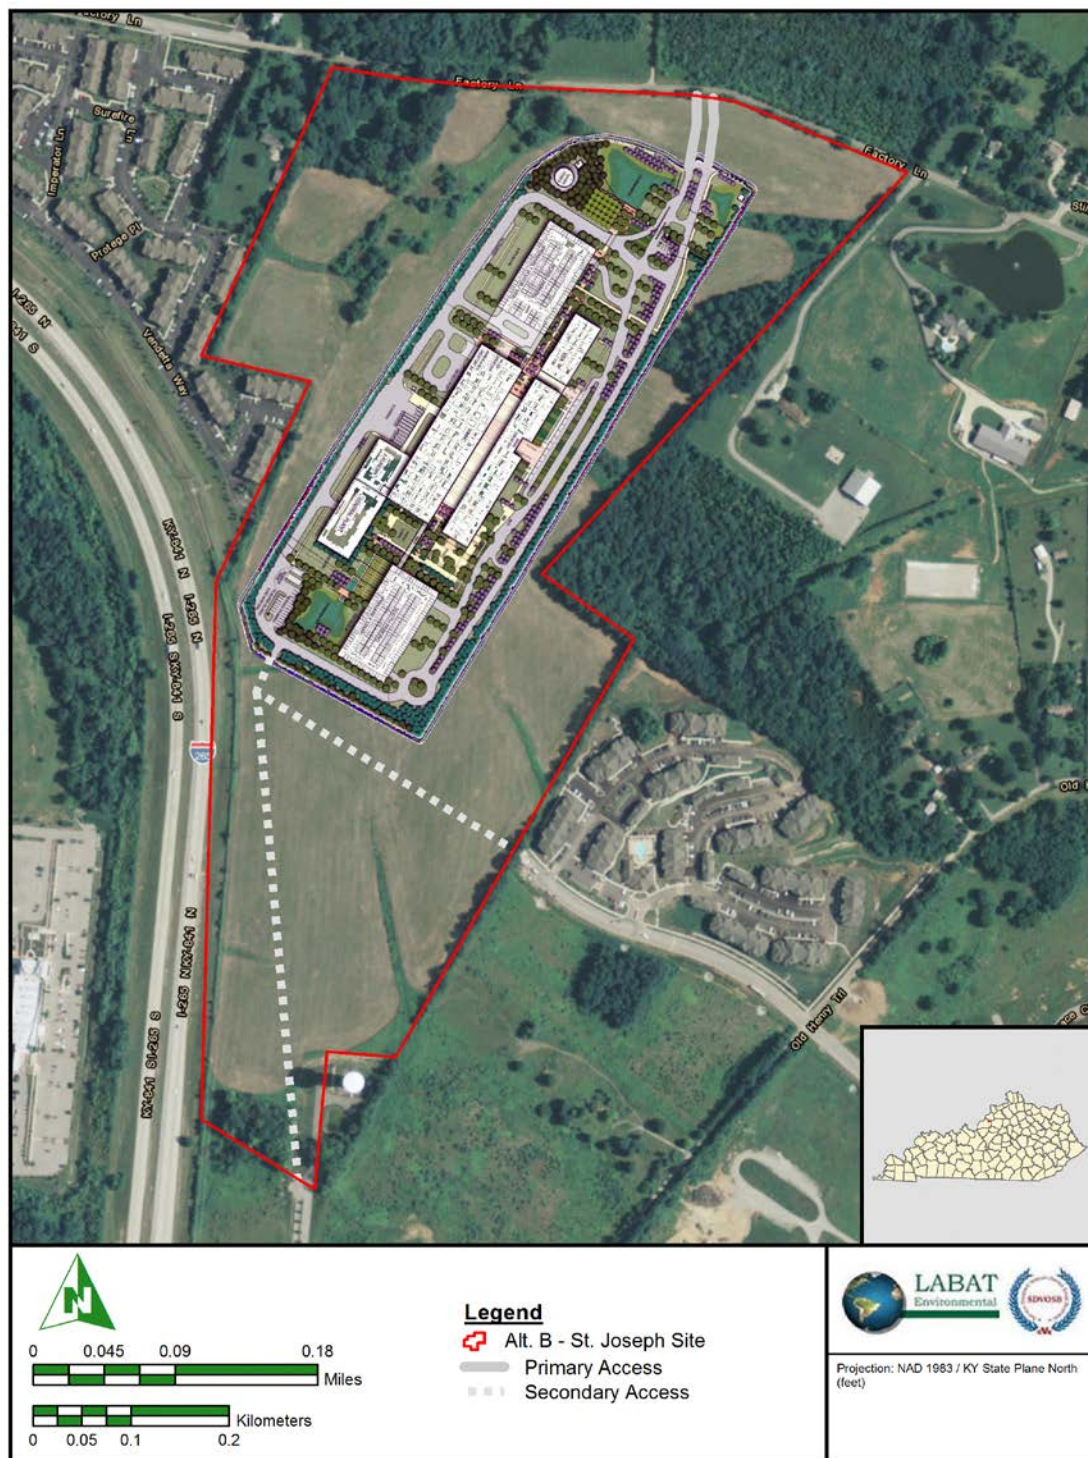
Site Plan Representative Illustration at St. Joseph Site
